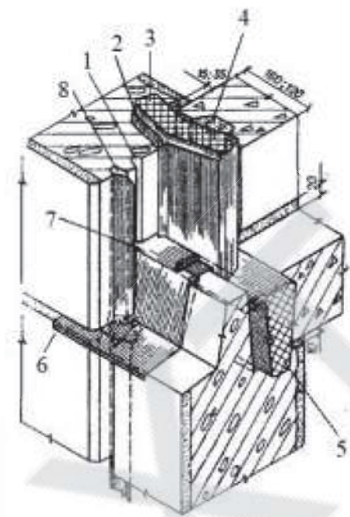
Open joint: 1 - decompression channel; 2 - air protection film; 3 - vertical thermal liner; 4 - concrete M150-200; 5 - horizontal thermal liner; 6 - drainage apron 220 mm; 7 - elastic gasket for the entire length; 8 - drainage tape
